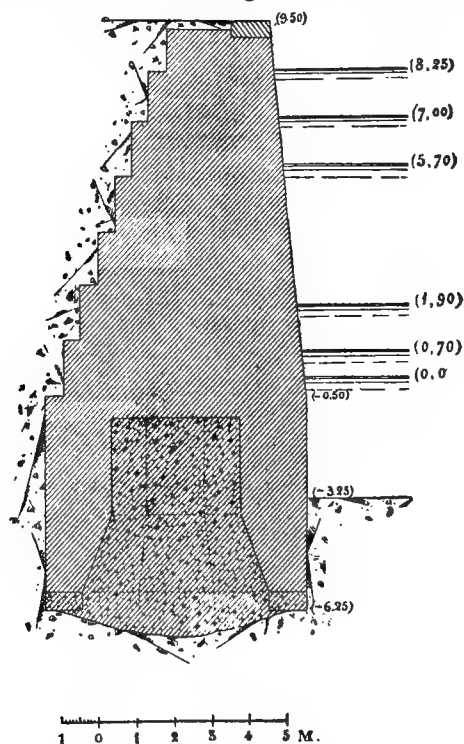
Cross section of the wall of the northeast quay of the outer harbor.
